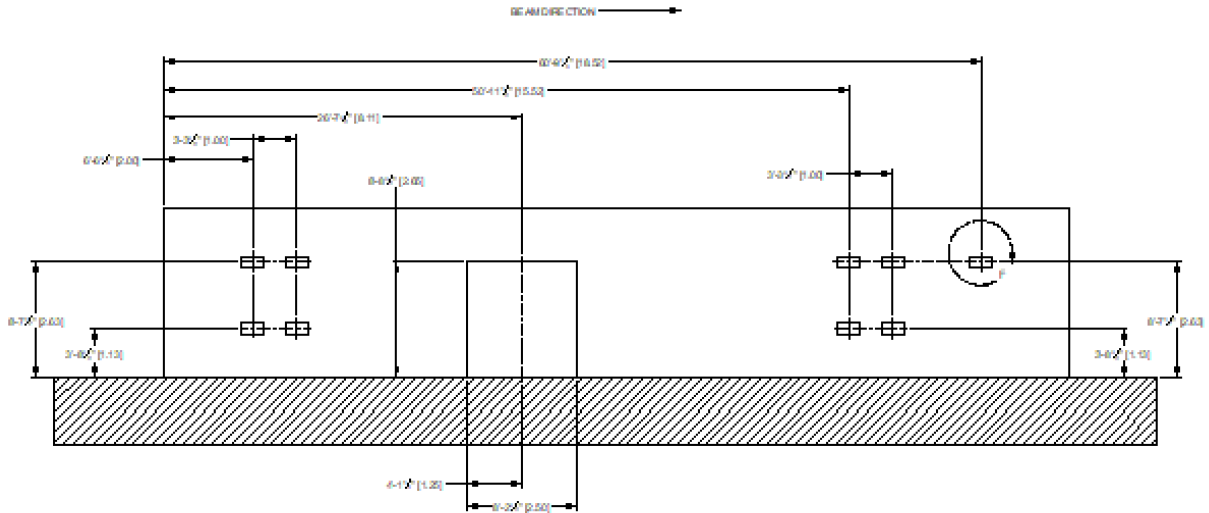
F-hutch inboard wall elevation showing door and wall labyrinths
